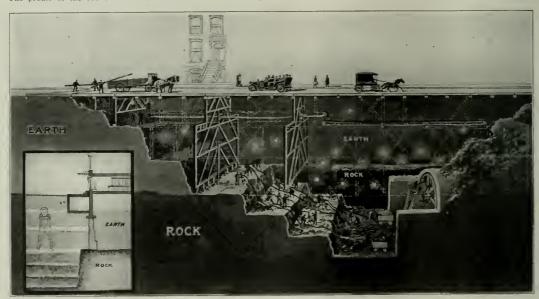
Proposed Method of Excavating Pennsylvania Crosstown Tunnels West of Fifth Avenue.
